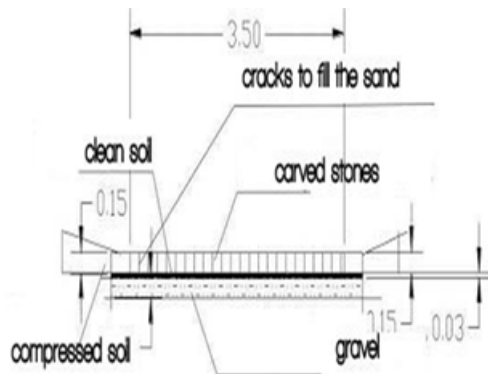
Standard cross-section of a stone road with compacted gravel and sand layers
